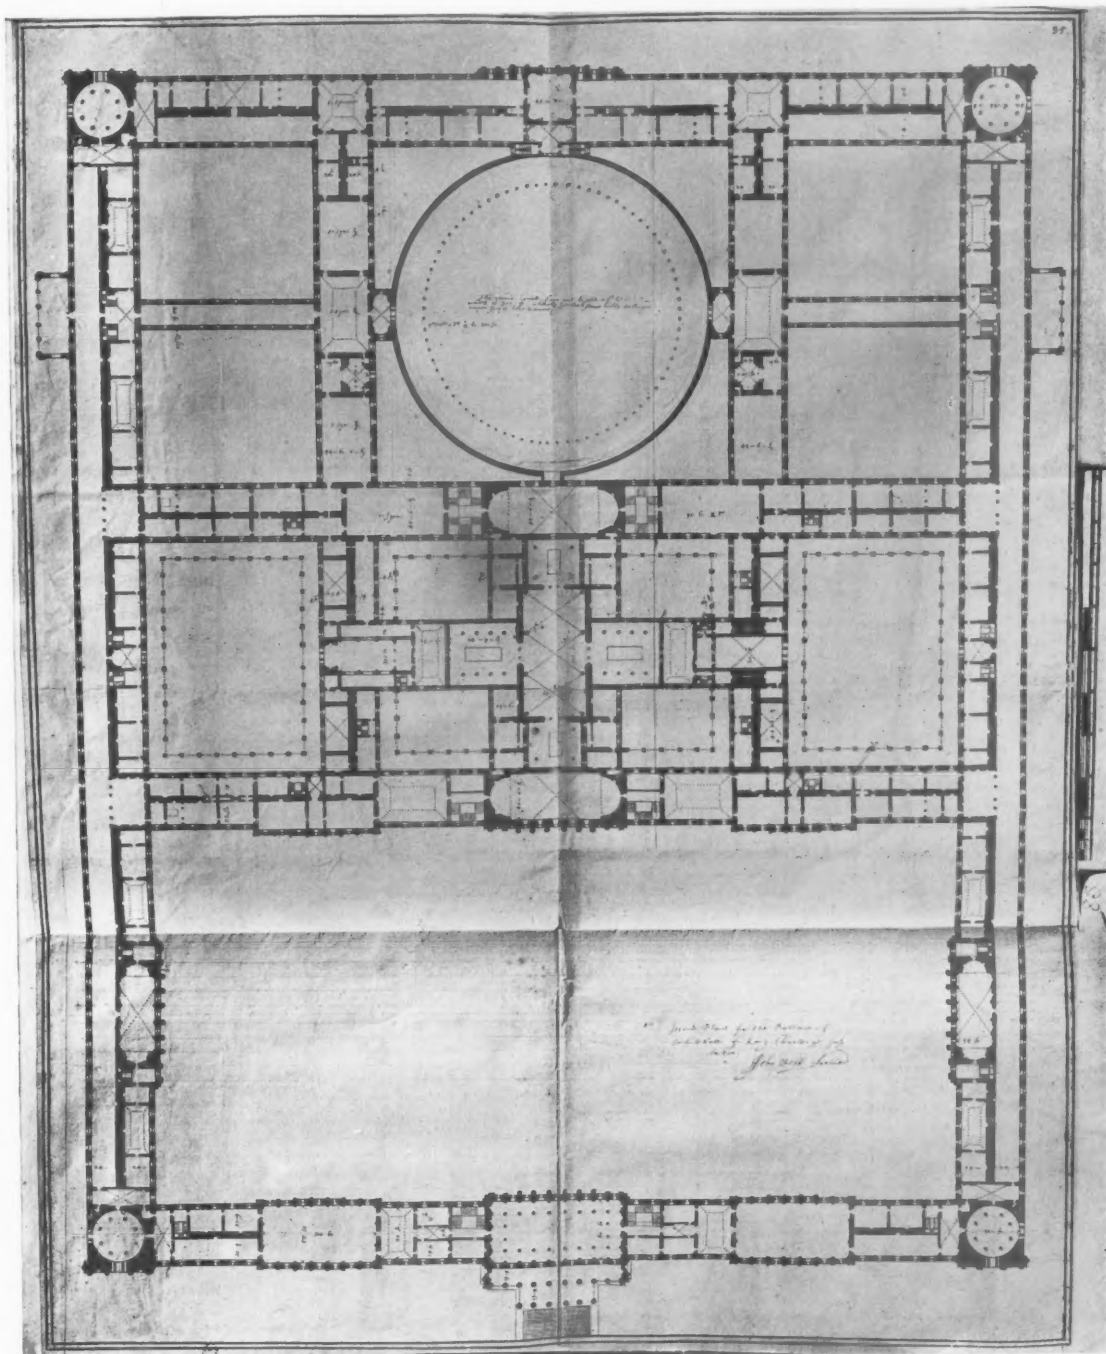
ANOTHER (AND DIFFERENT) GROUND-FLOOR PLAN FOR THE SAME SCHEME AS THAT SHOWN BY FIG. 16, SIGNED BY JOHN WEBB
